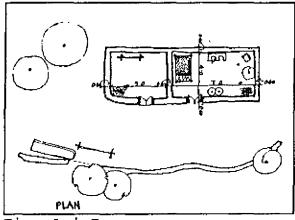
i Plan of a TYPICAL SINGLE STOREY HOUSE IN GARHWAL
